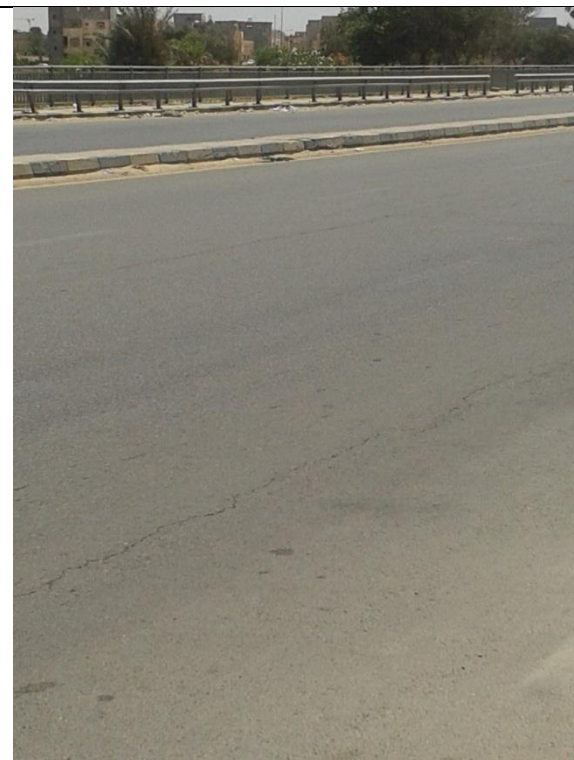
Detail of asphalt wearing layer with longitudinal crack
